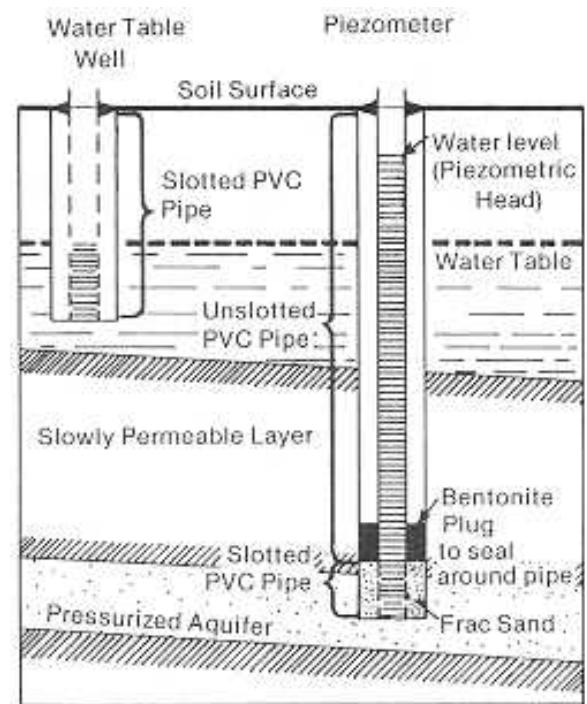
Water table well and piezometer construction. Note: Many small diameter farm wells are, indeed, piezometers because they intercept water from a specific water-bearing layer.
